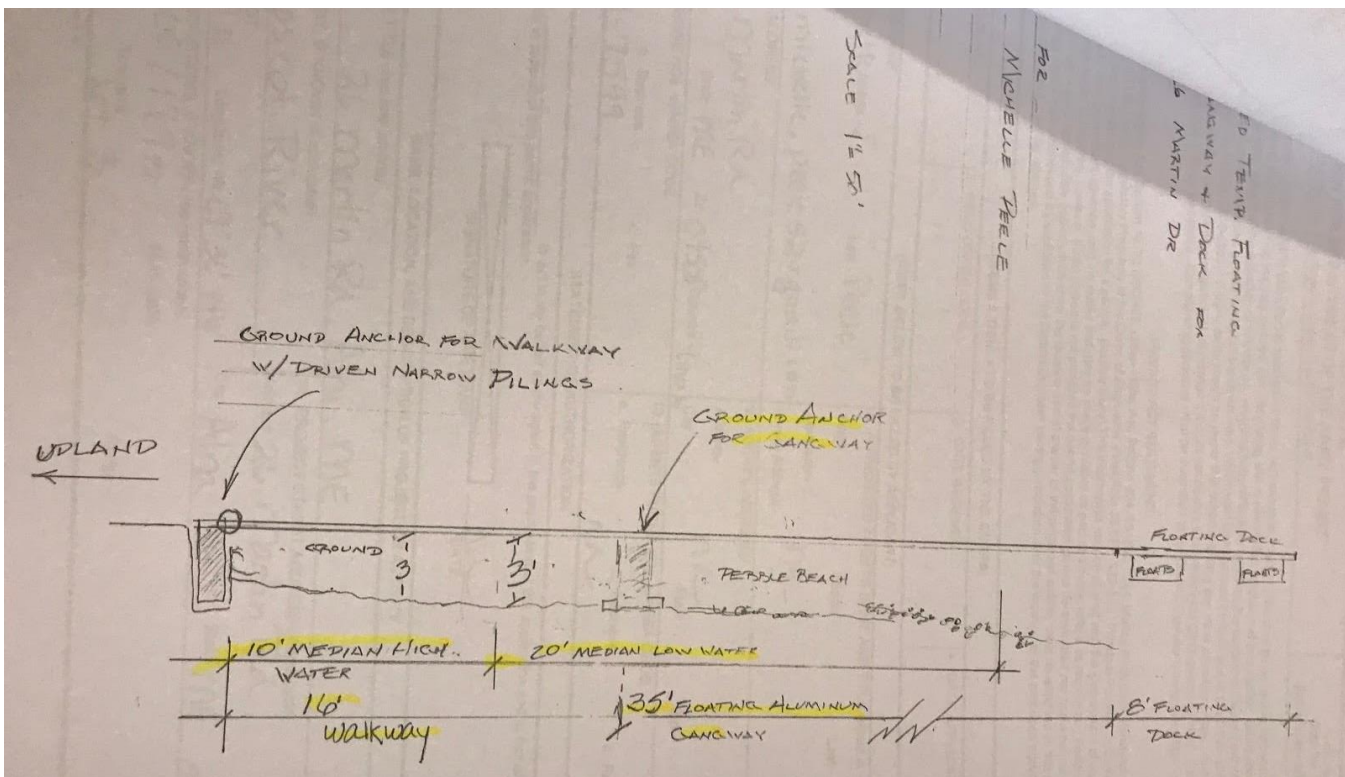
Peele - 8'x12' dock w/ 3'x16' pier, 3'x35' alum ramp & 17' boat (right hand of two shown) - 6/7/16 permitted w/ upland piles
